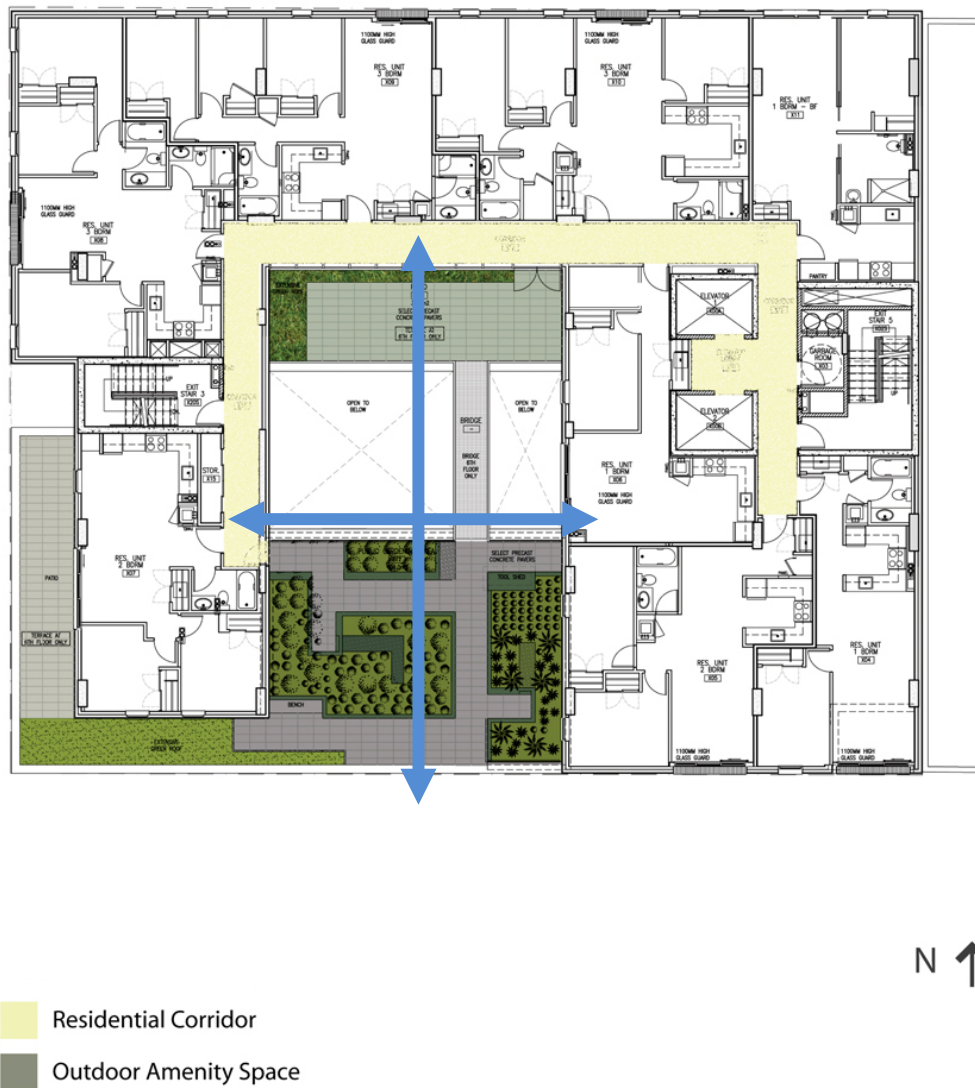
The sixth floor plan; the open terrace garden allows cross-air circulation and brings daylight into the abyss (Source: ArchDaily, 2010).
